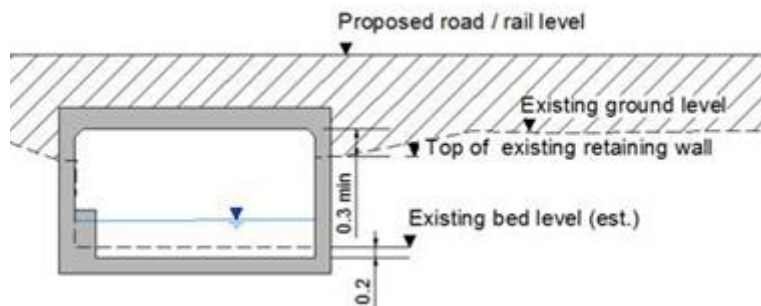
Proposed Chadwell Cross Sewer culvert design Source: Atkins
